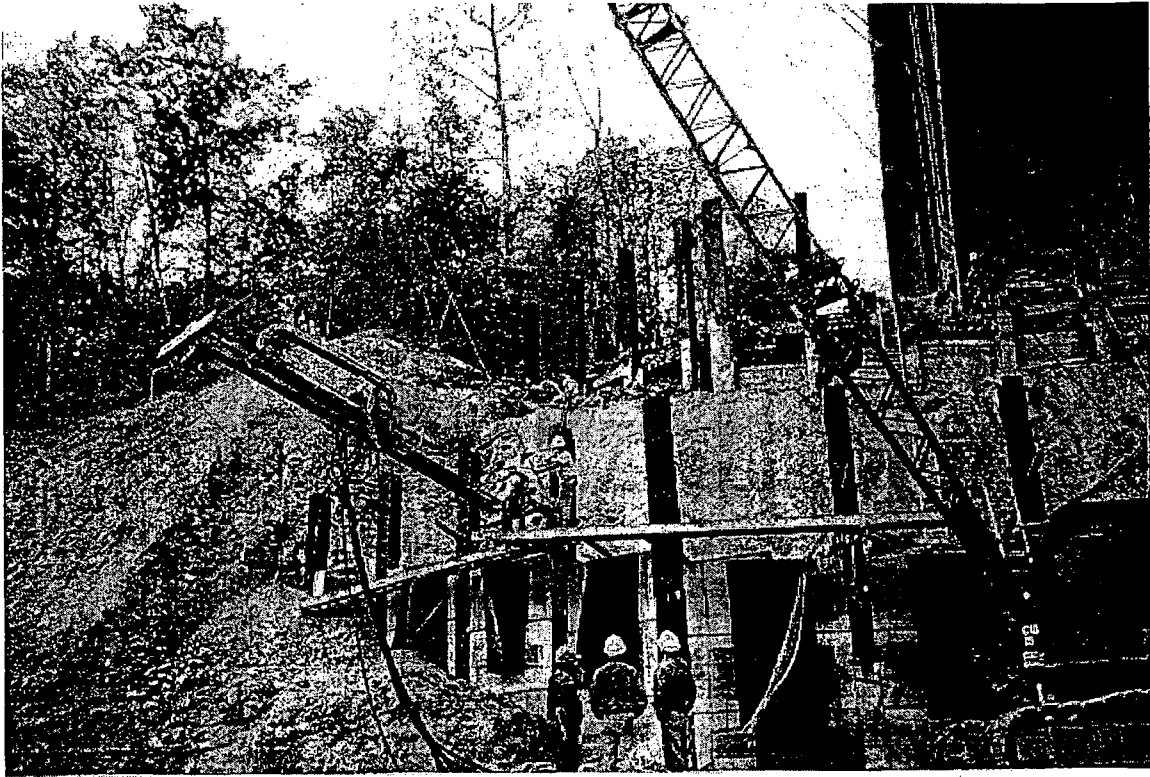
Drilling an anchor hole in the lower tier wall.
